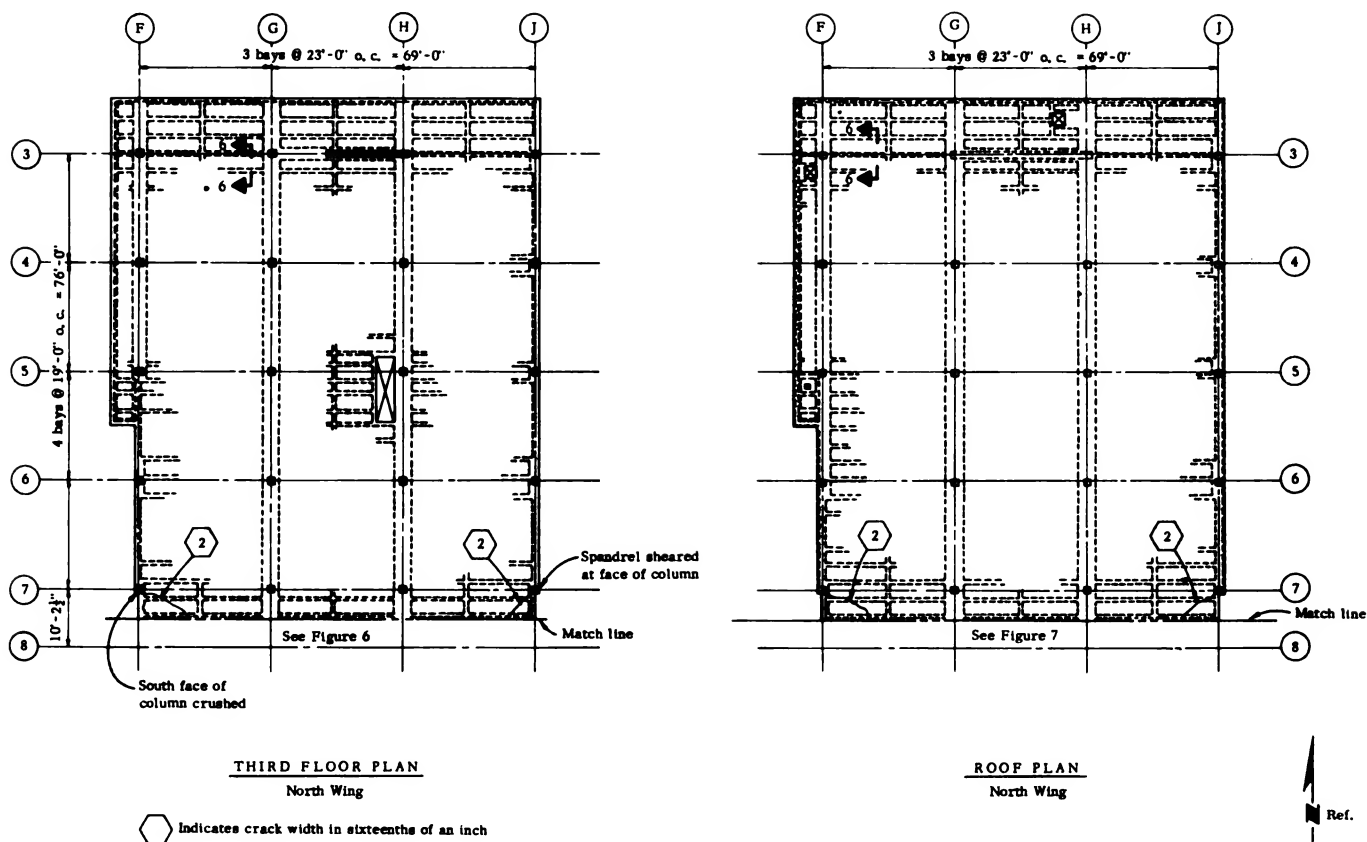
Holy Cross Hospital. Framing plans, north wing.
